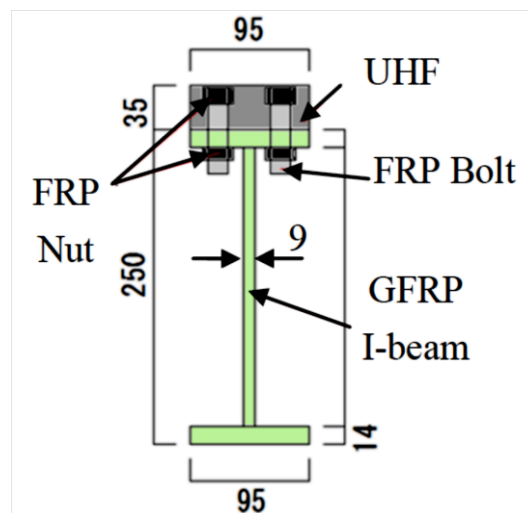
Cross-section of UHF/GFRP I-beam (mm) [27]
